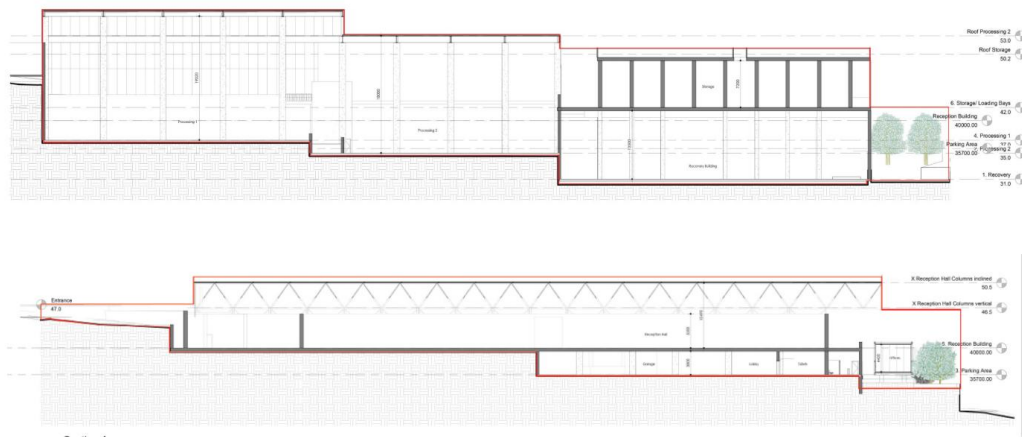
Representative Cross-Sections of the MRF Structure indicating Projected Ground Level Elevations of each Floor.
